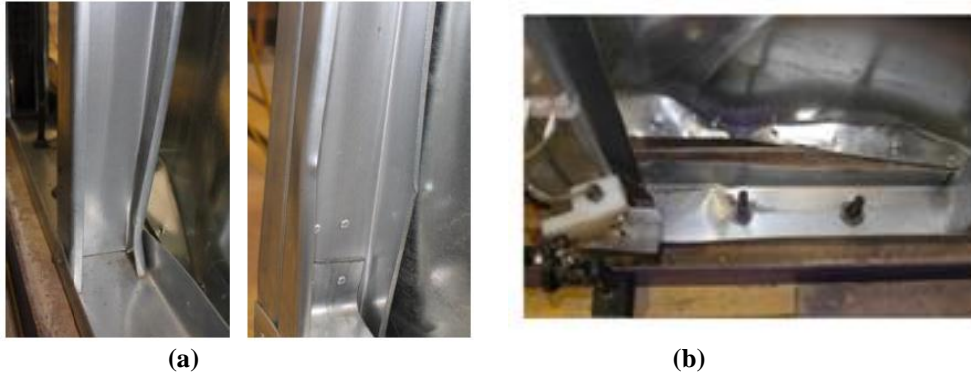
Local buckling of columns and beams in a light shear wall during the research of Esmaeali Niari et al. [4]
